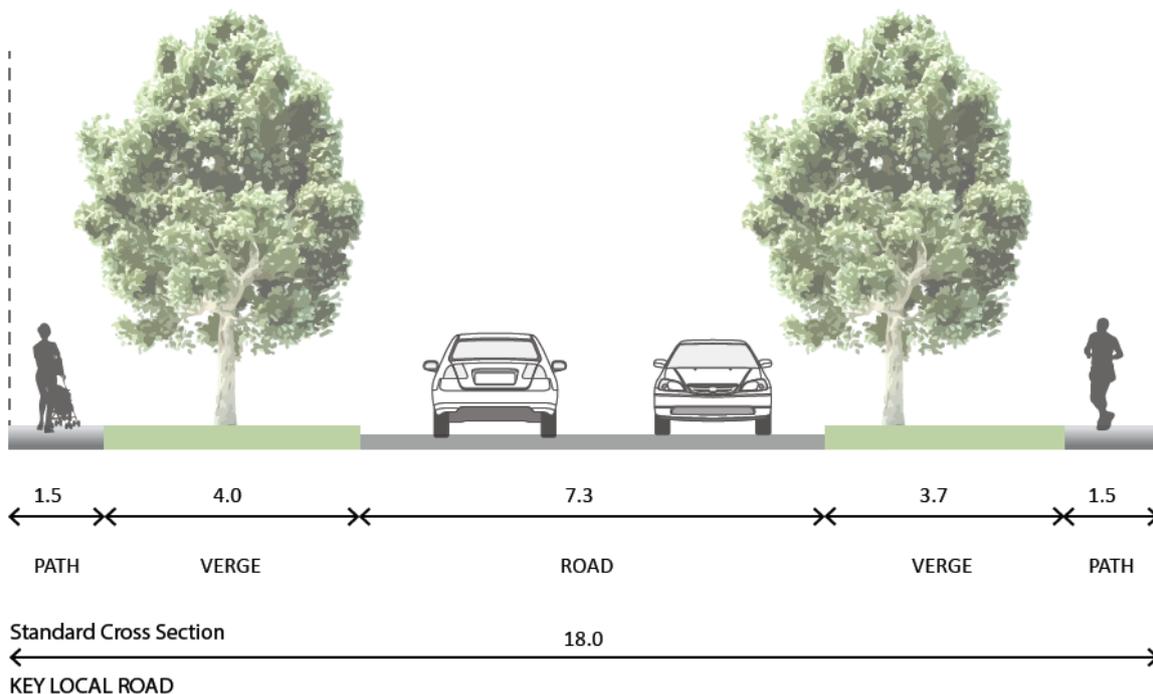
Standard cross section for Key Local Roads as per the Kilmore Structure Plan
